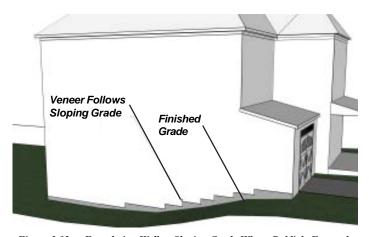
Foundation Wall at Sloping Grade Where Publicly Exposed
